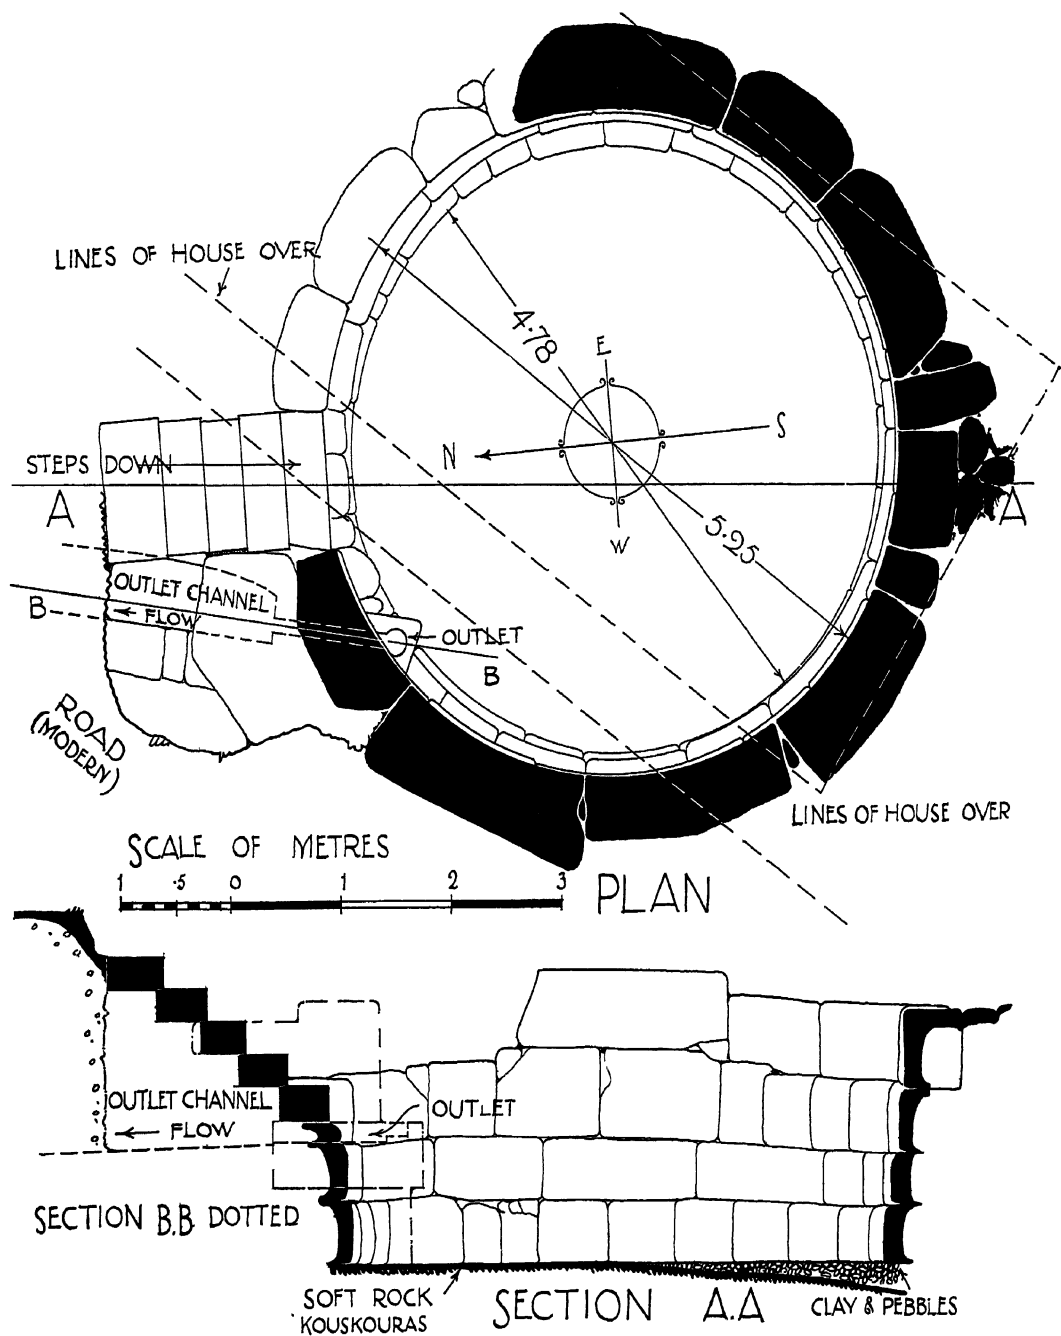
PLAN AND SECTION OF CIRCULAR SPRING CHAMBER, ARKHANES (BY PIET DE JONG).
